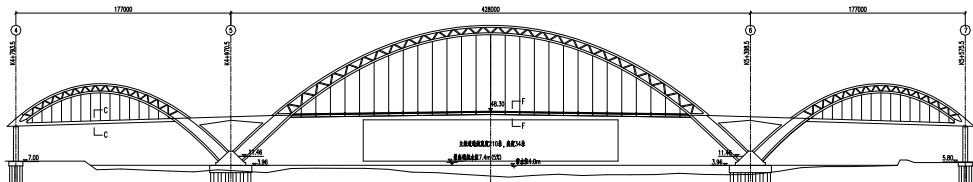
General arrangement drawing of the main bridge of Xinguang Bridge (Unit: mm)
